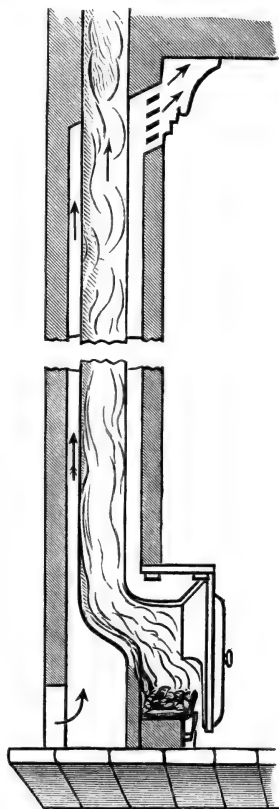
SECTION OF GALTON FIREPLACE AND CHIMNEY. (Lincoln.)
